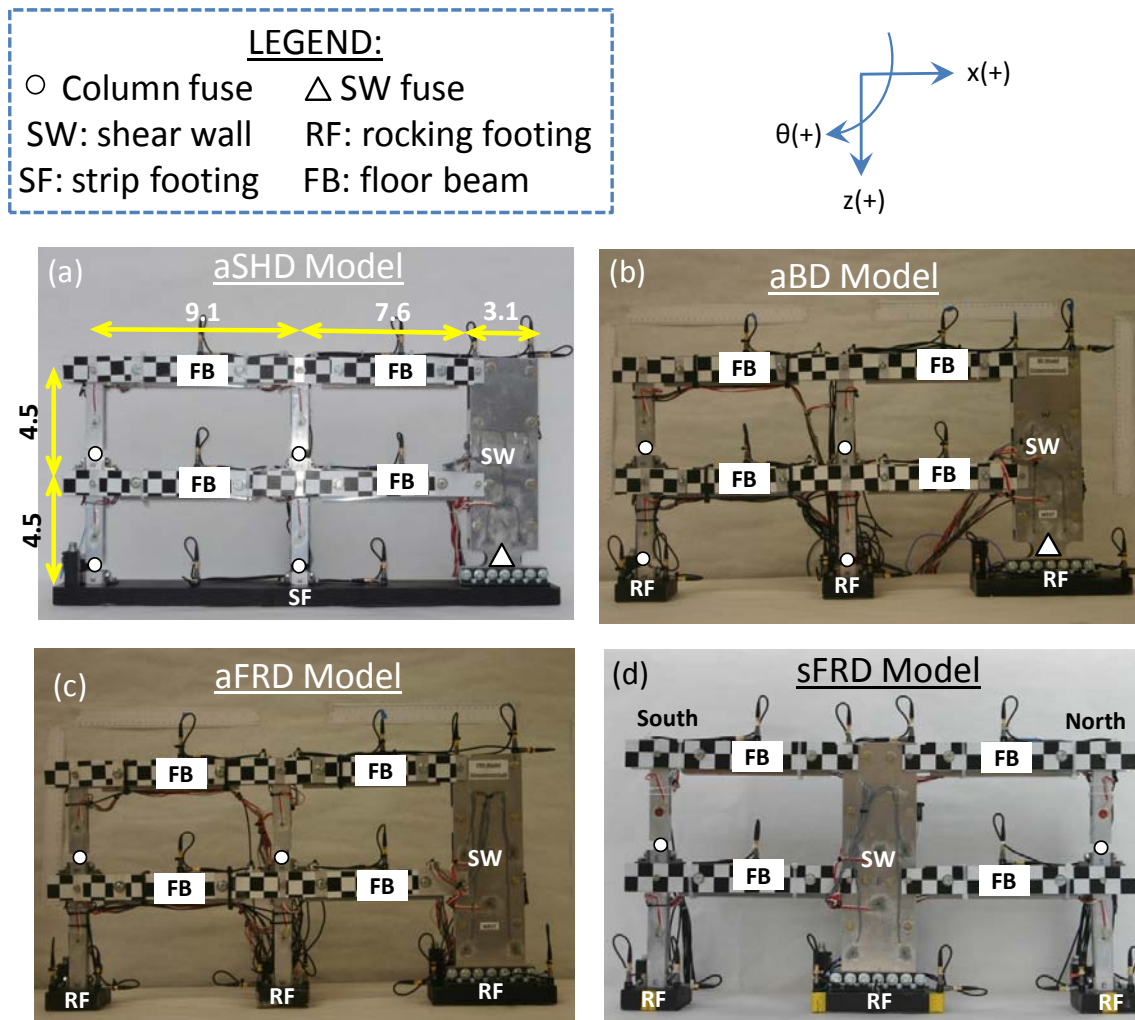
Constructed frame-wall-foundation models: (a) aSHD model; (b) aBD model; (c) aFRD model; (d) sFRD model (in prototype unit: m)
